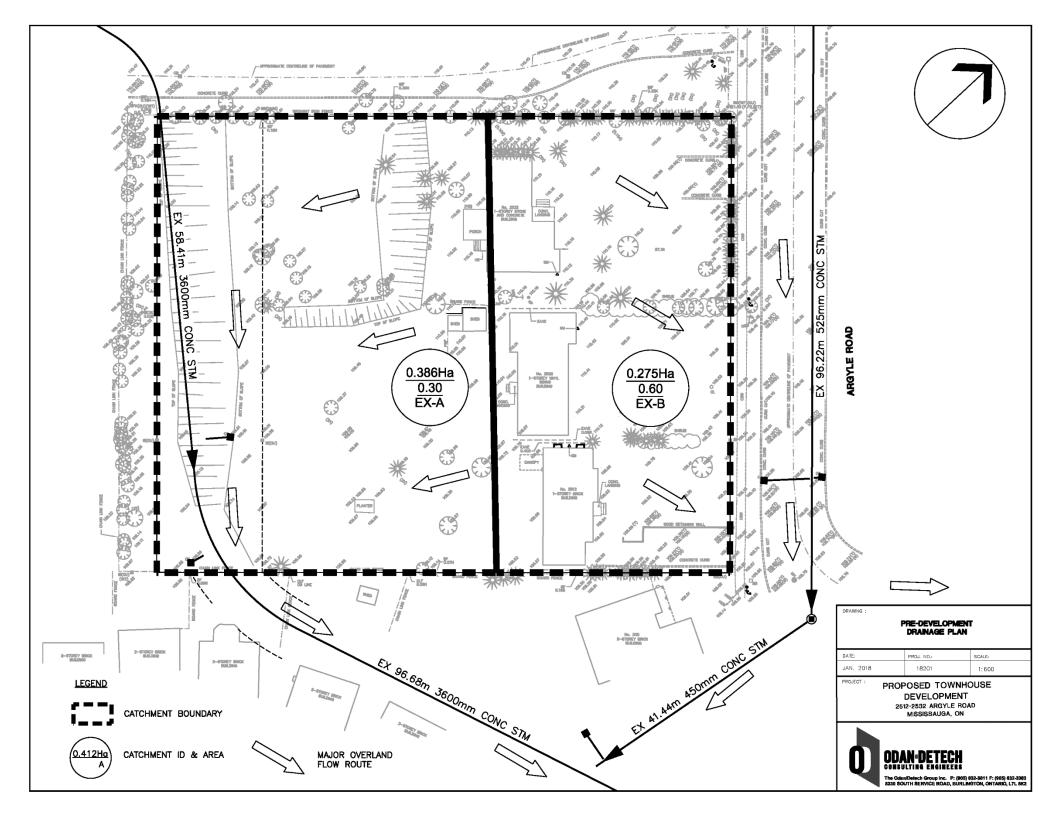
Excerpt from Argyle Road storm drainage plan showing area in site with allocation
